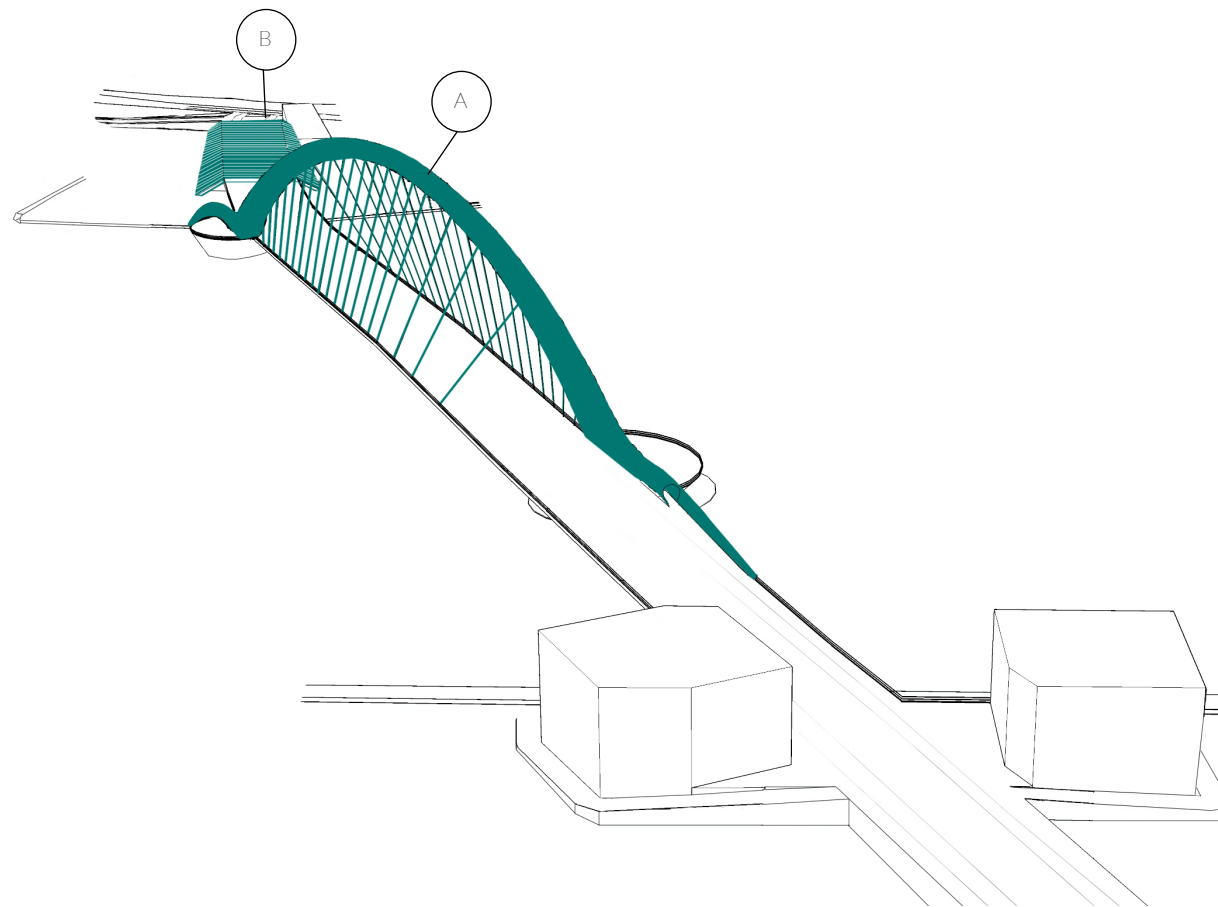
Constructive elements in a birds eye view from the bridge and the landing
